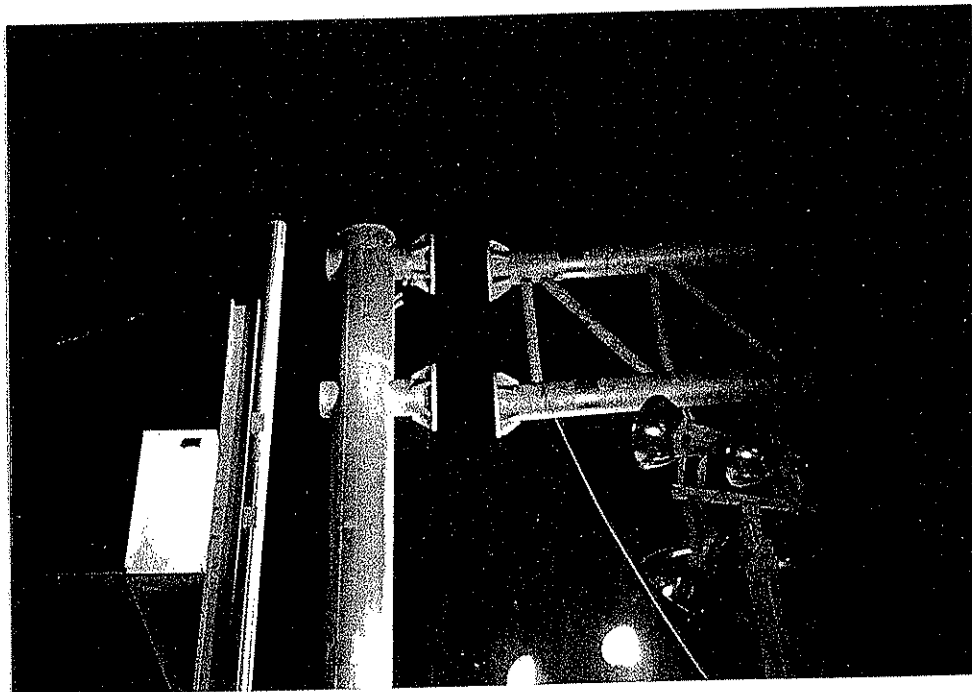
VMS and Truss Lifted into Position for Connection to Column.
